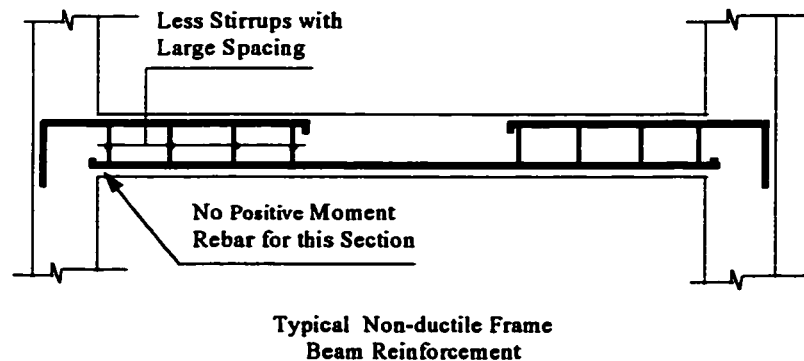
Typical Non-ductile Frame Beam Reinforcement
